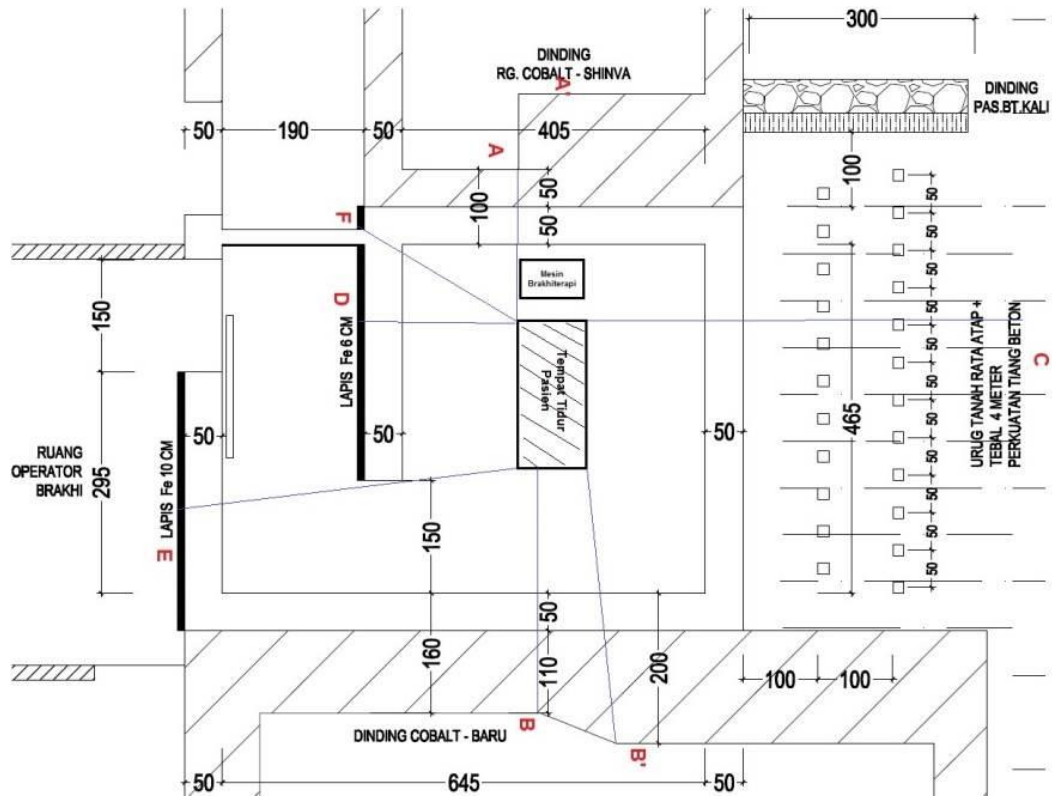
Site Plan of the Brakhiterapi Co-60 Room
